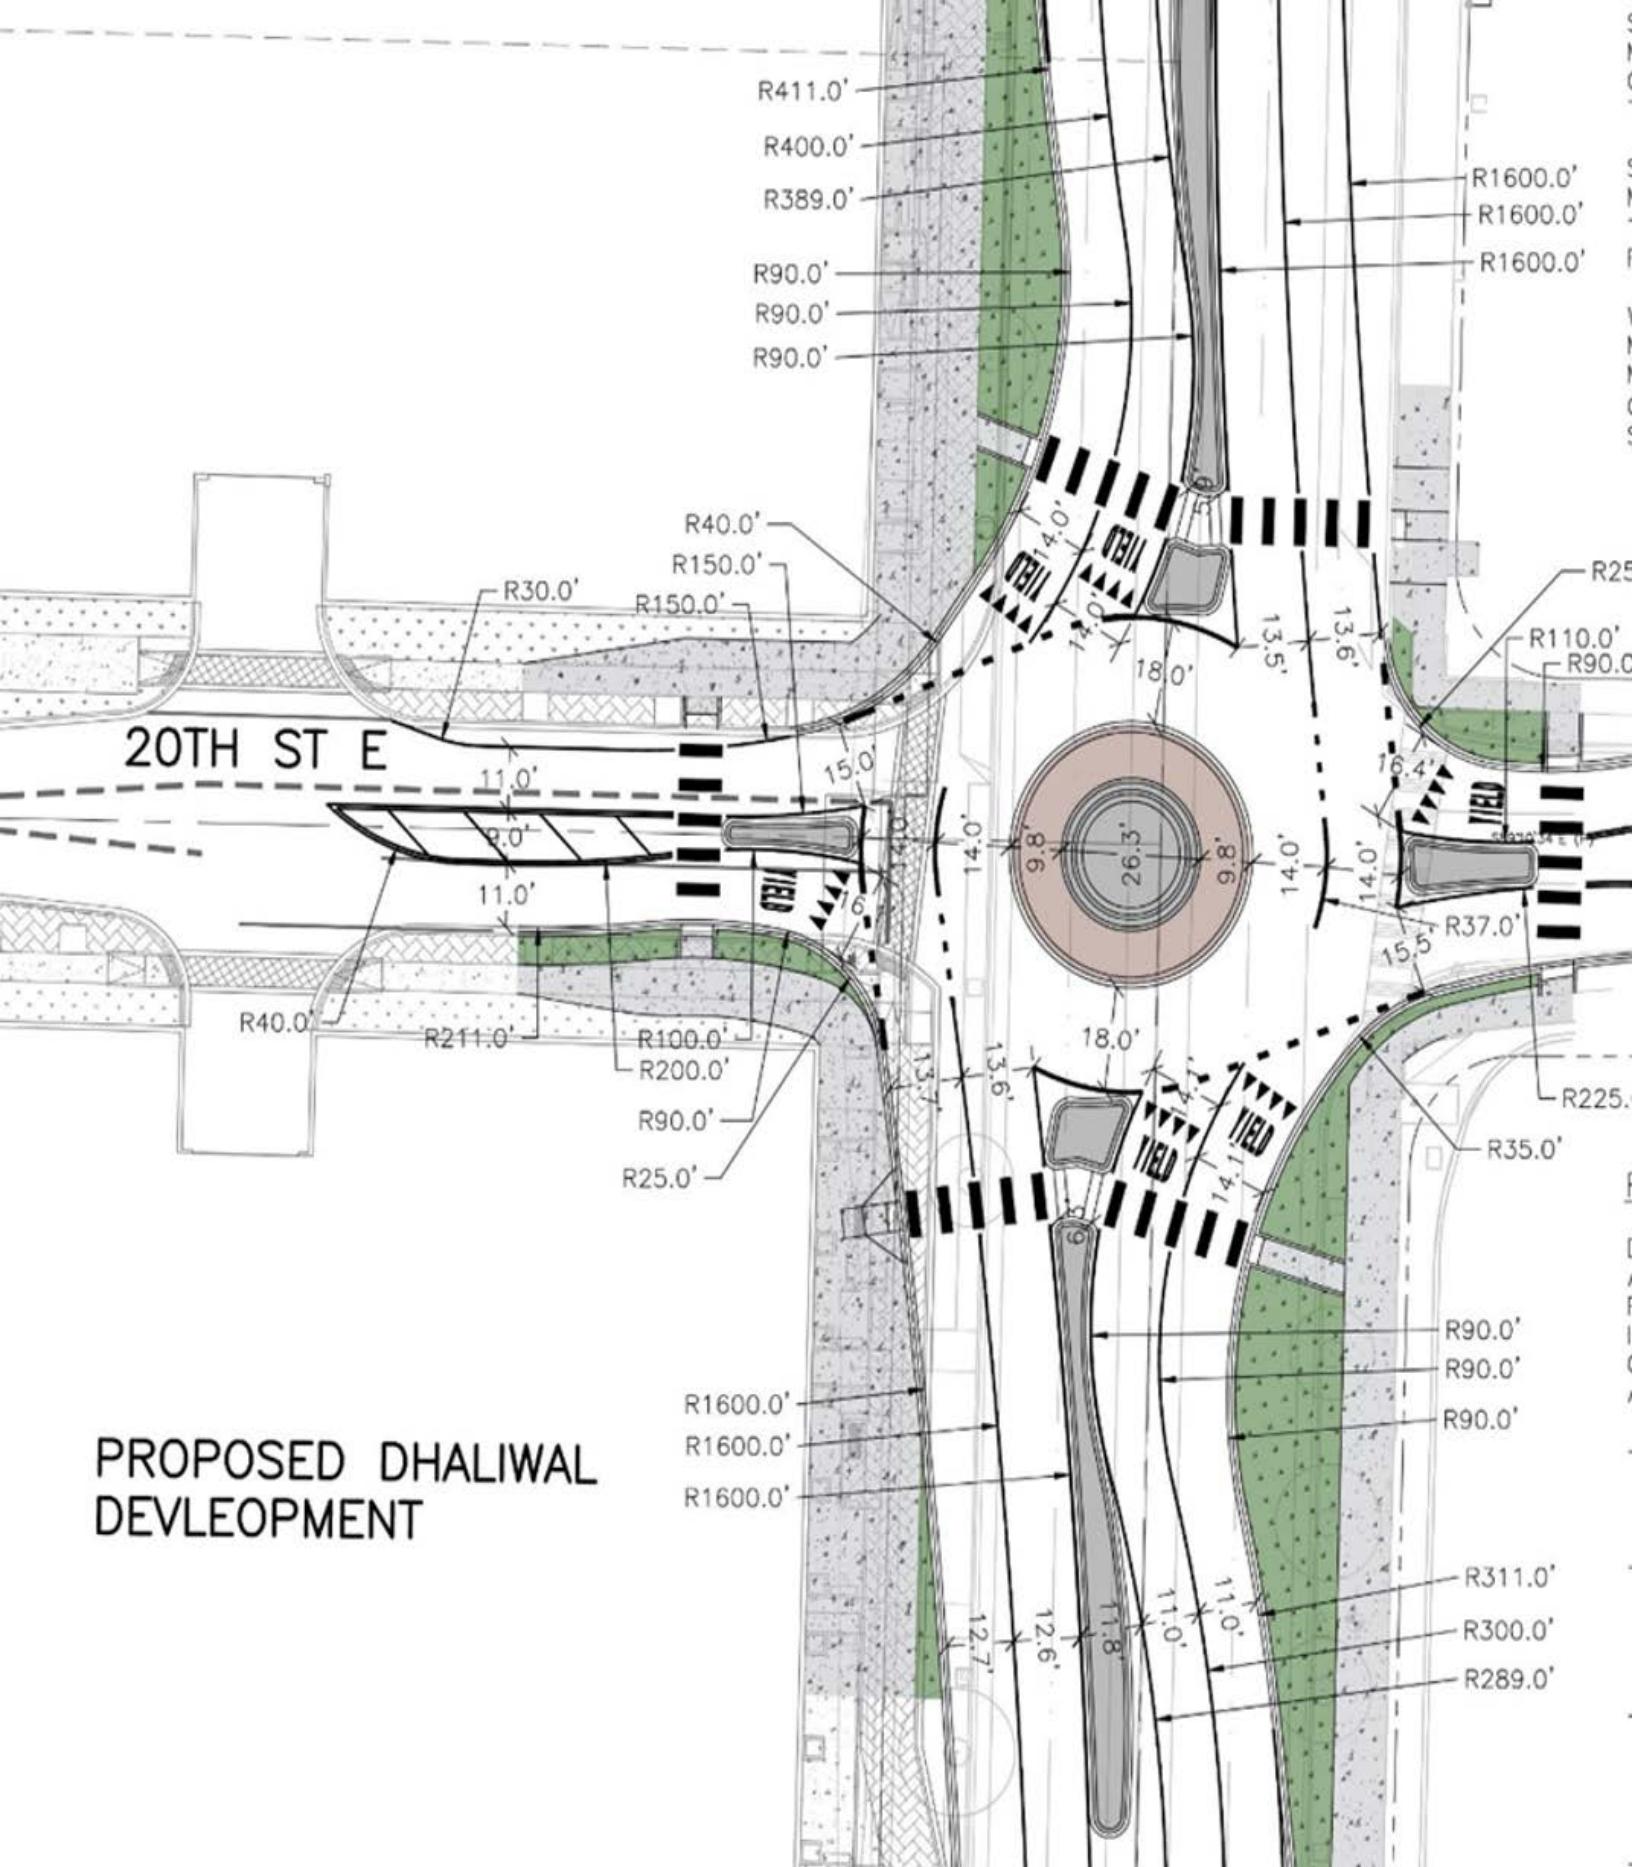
Planned Layout of SR 161/20th Street Roundabout
